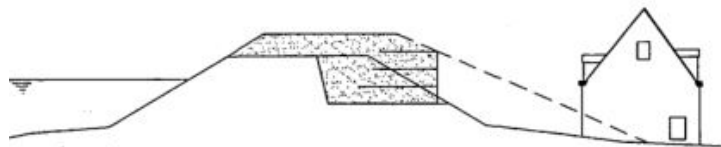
Example of reinforced vertical concrete structure as alternative for widening of the dike
